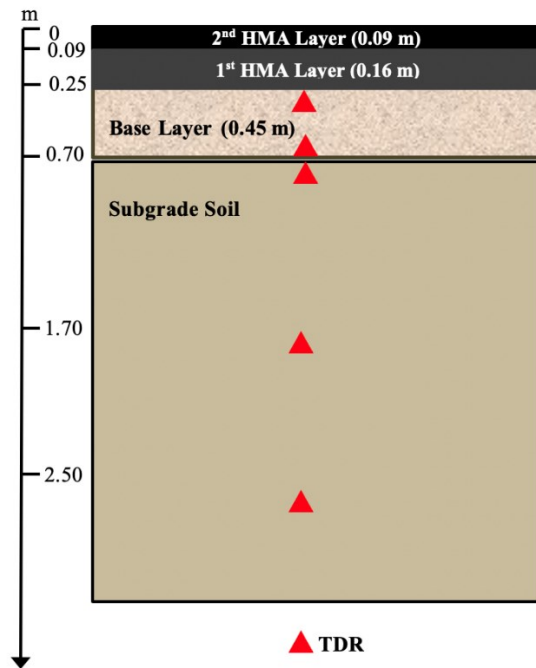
Pavement structure and location of time-domain reflectometers installed in the base and subgrade of the IRRF test road
